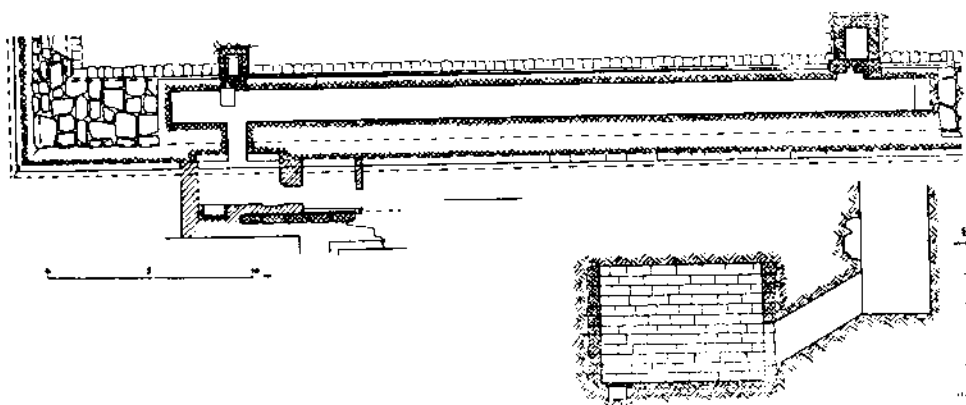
Plan of the corridor-chapel and section of the burial-chamber in the mastaba of Hemiwnw (Giza, 4000).
